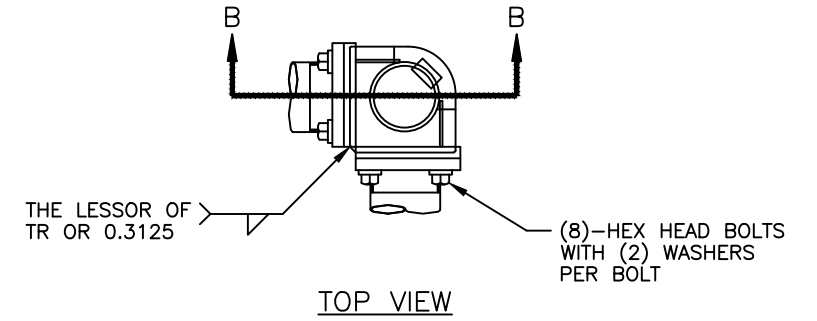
LUMINAIRE ARM ATTACHMENT
